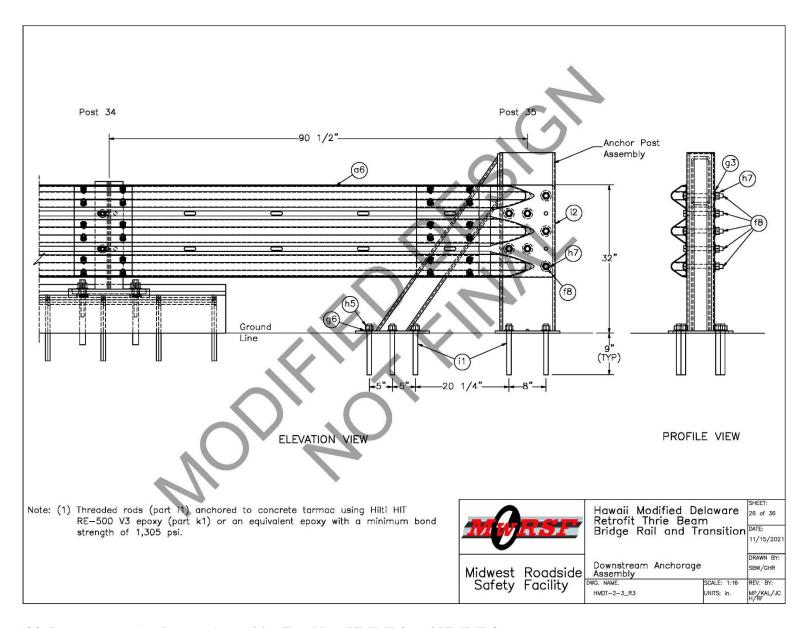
Downstream Anchorage Assembly, Test Nos. HMDT-2 and HMDT-3
